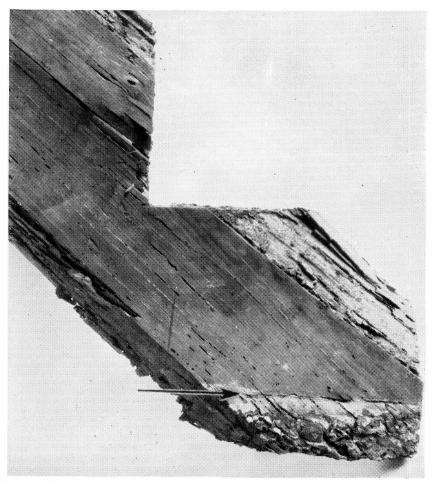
Termite damage to stair carriage in basement, resulting from the member being put in place before the concrete floor was poured. Line across bottom of carriage (arrow) indicates floor level.
